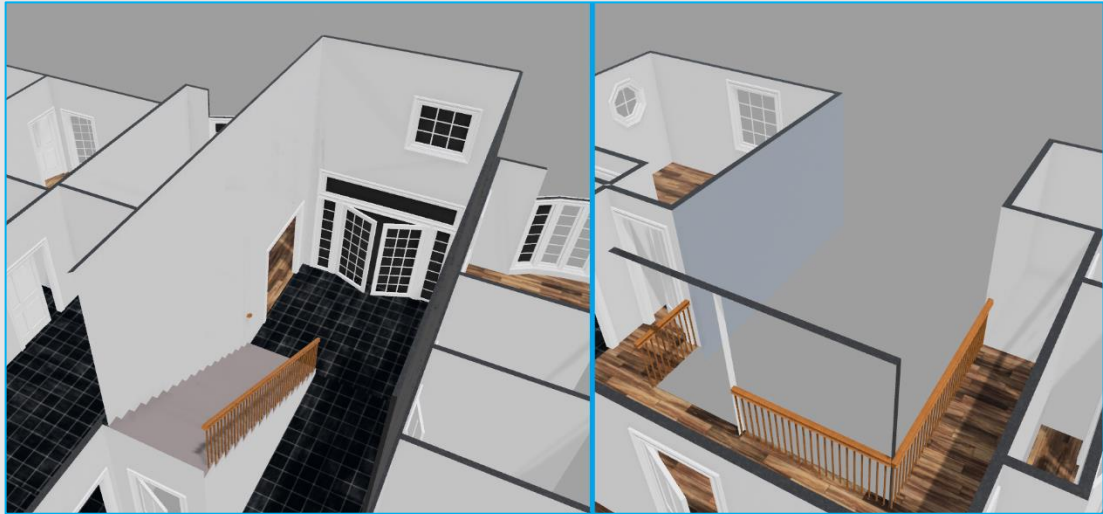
Walls Sketched at Full Height in Main Floor (Left) and Respective Stairs Down & Open to Below in 2nd Floor (Right)
